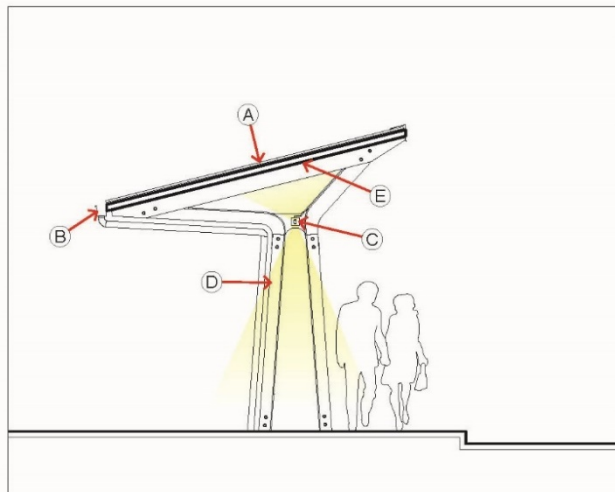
Transit canopies typical section and North Transit Canopy section
